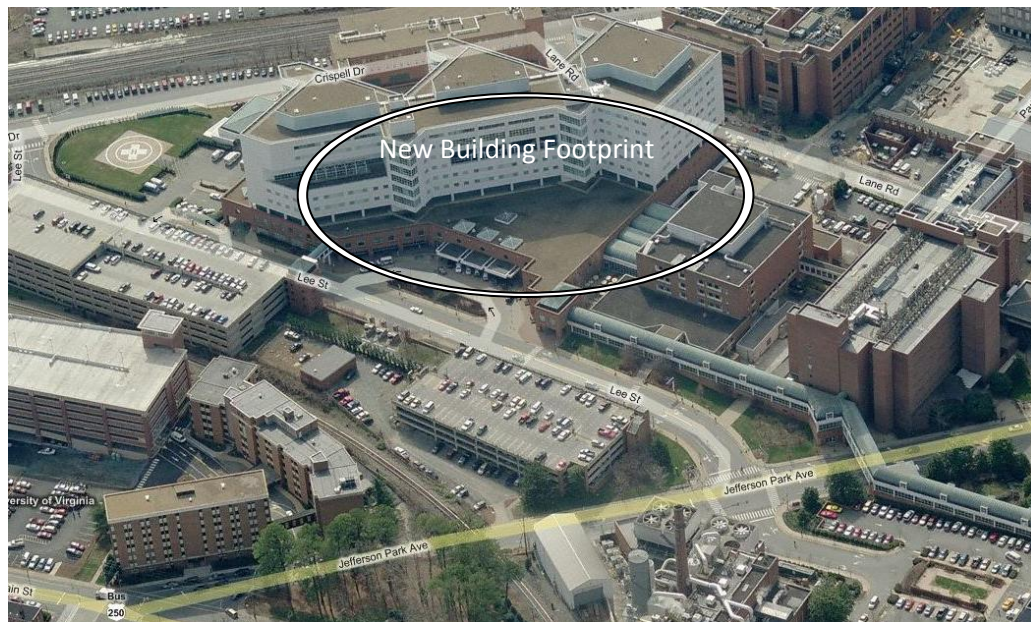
shows the existing lobby and discharge center which will serve as the new building footprint
